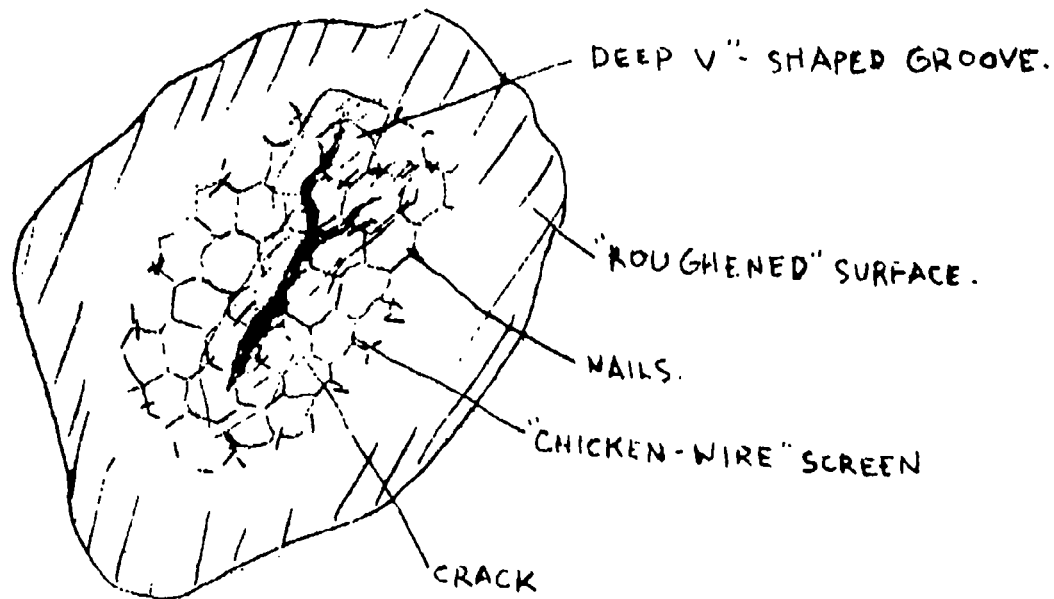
REPAIRING "CRACKS" IN MASONRY WORK
